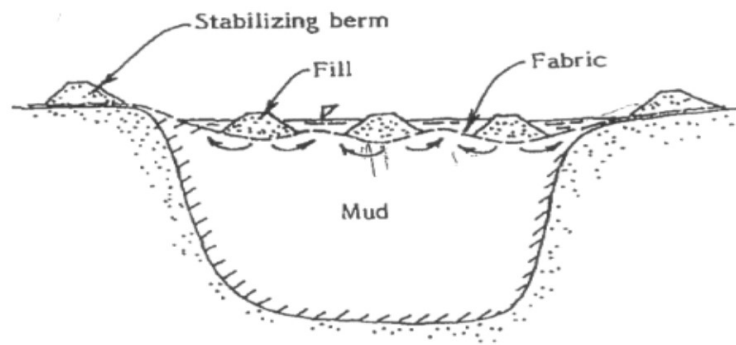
Cross section of soft soil stabilization using berms (Brons, 1987)
